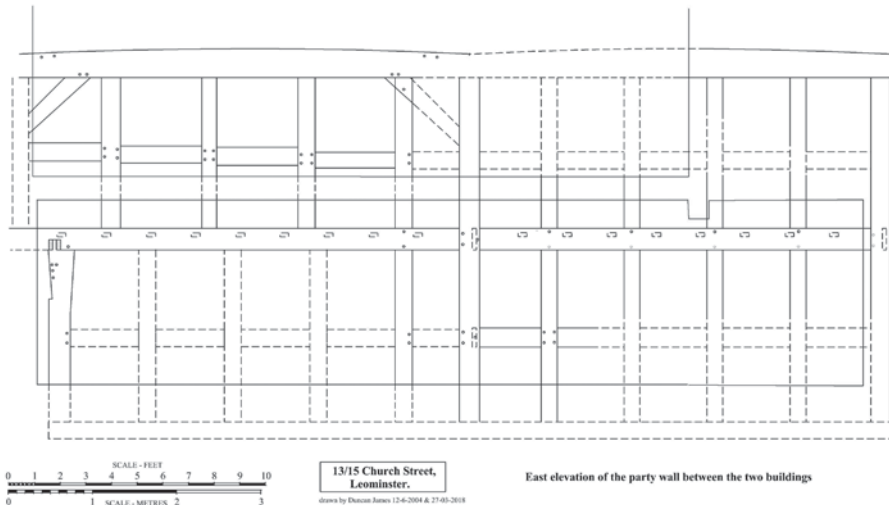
East elevation of the timber-framing between 15 Church Street, Leominster and the house alongside at 11/13 Church Street.
